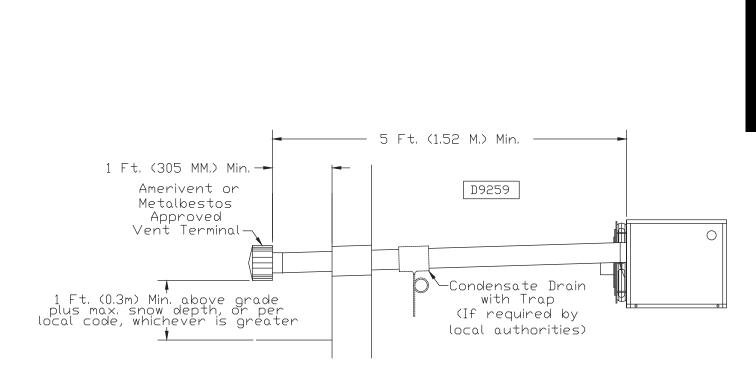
Category III Horizontal Venting Requirements Using Single Wall Vent Pipe
